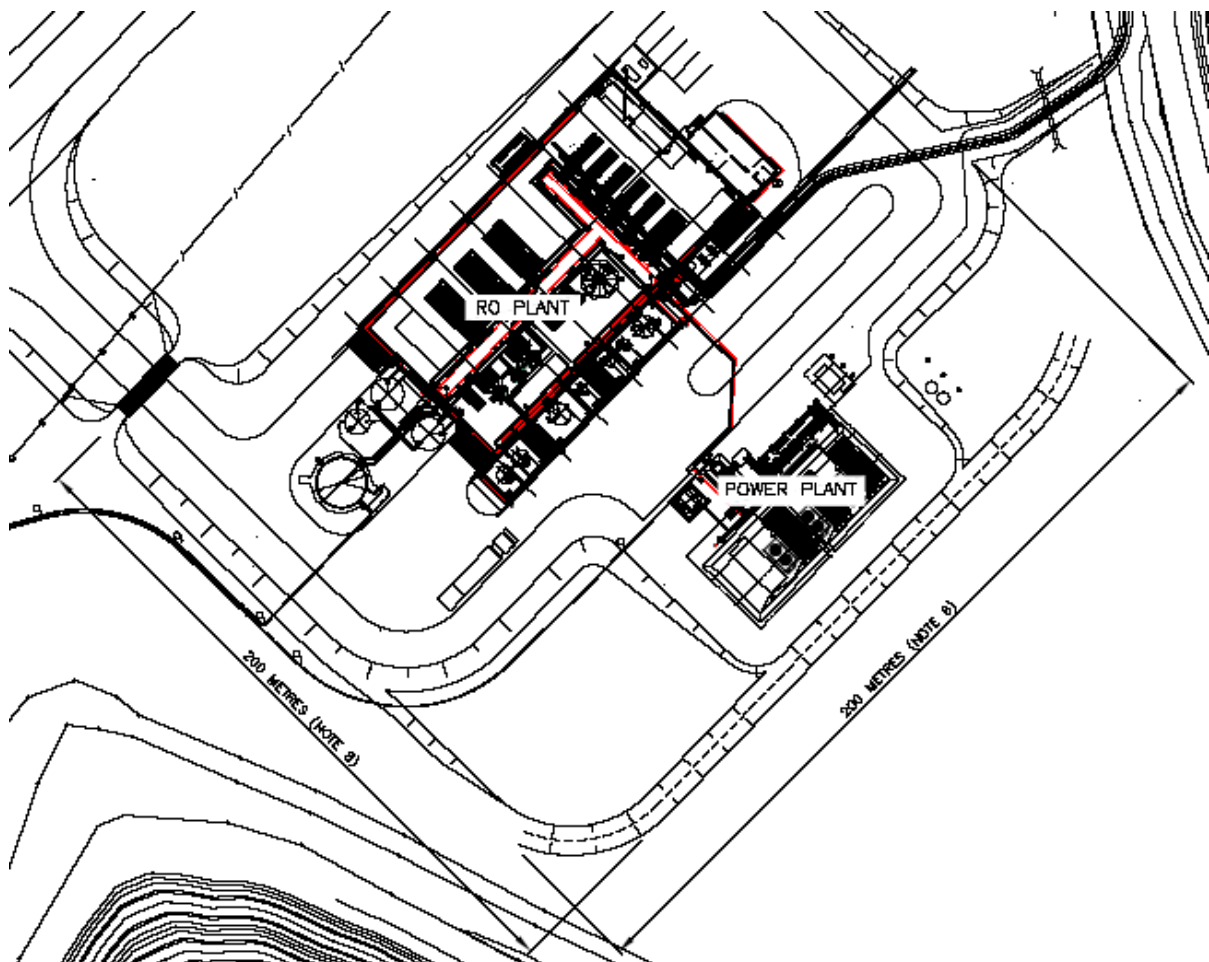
Water treatment facility concept layout (Source: Australia Pacific LNG)
